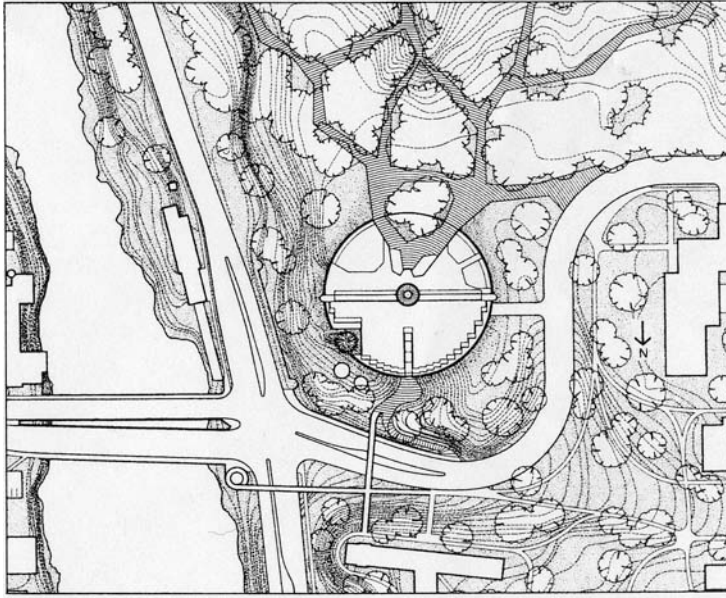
Site Plan of the University of Iowa's College of Law (Gunnar Birkert)
